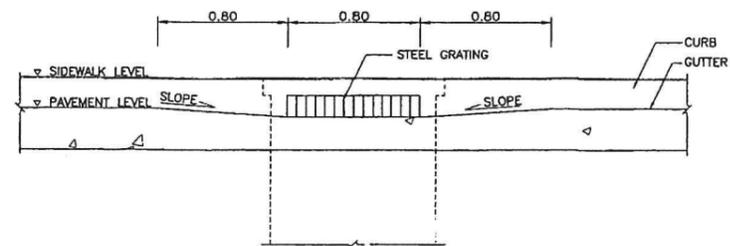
DETAIL OF CURB AND GUTTER OR CURB AT RAISED MEDIAN
